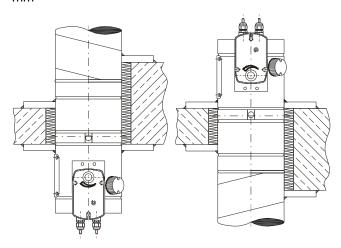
Imbedding the round fire damper in the ceiling with Rockwool
